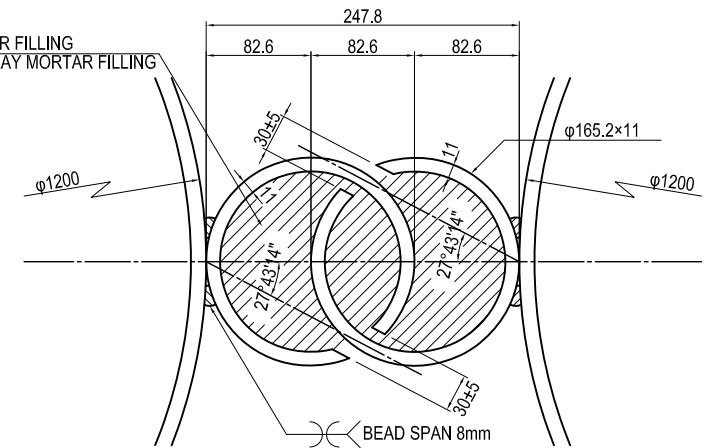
DETAIL OF PERIMETER FIELD WELDING OF STEEL PIPE SHEET PILE S=1:4
